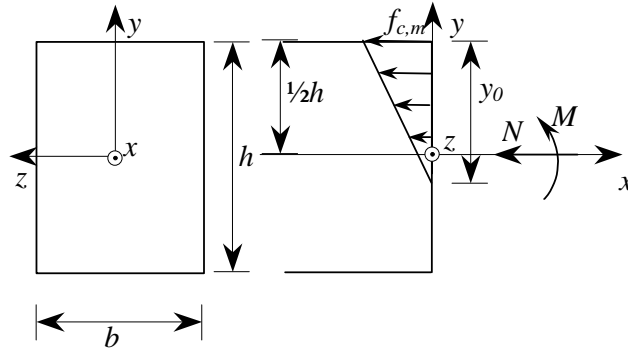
Cross section of unreinforced masonry (the bricks and joints are not shown)
